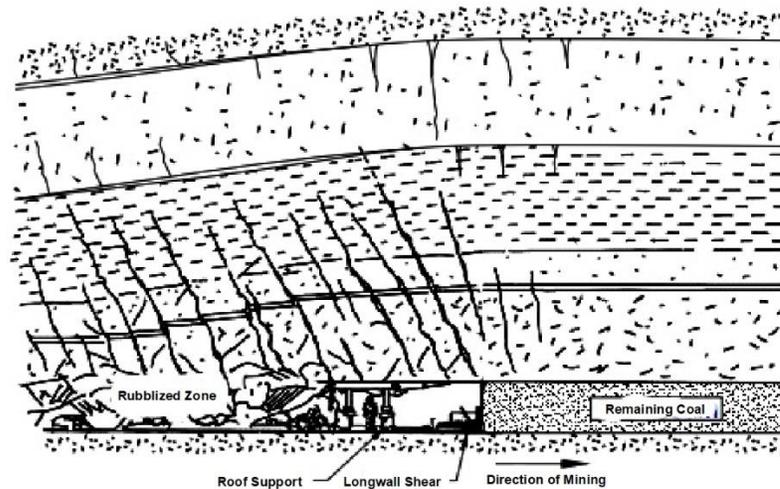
Cross section of typical longwall face with resultant rubblization of overlying strata after mining, adapted from Mine Subsidence Consultants (2007). Note the rubblization of overlying strata behind the roof supports.
